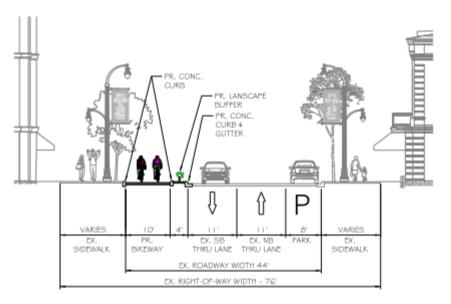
Typical Section between Wayne Avenue and Ellsworth Drive
